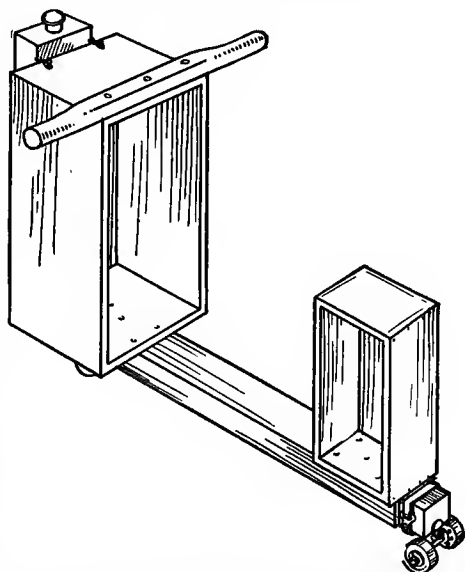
View of Skatemobile from the Side. The "driver" sits upon the small box when coasting.
